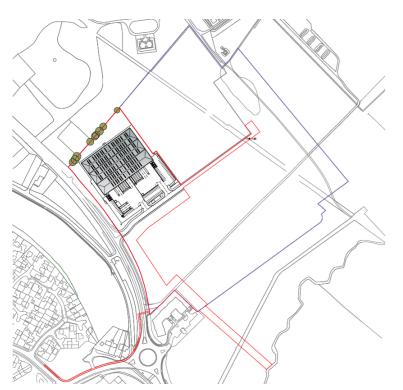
Location Plan for Proposed Phase 01— Block 3 (Units 3A and 3B)
